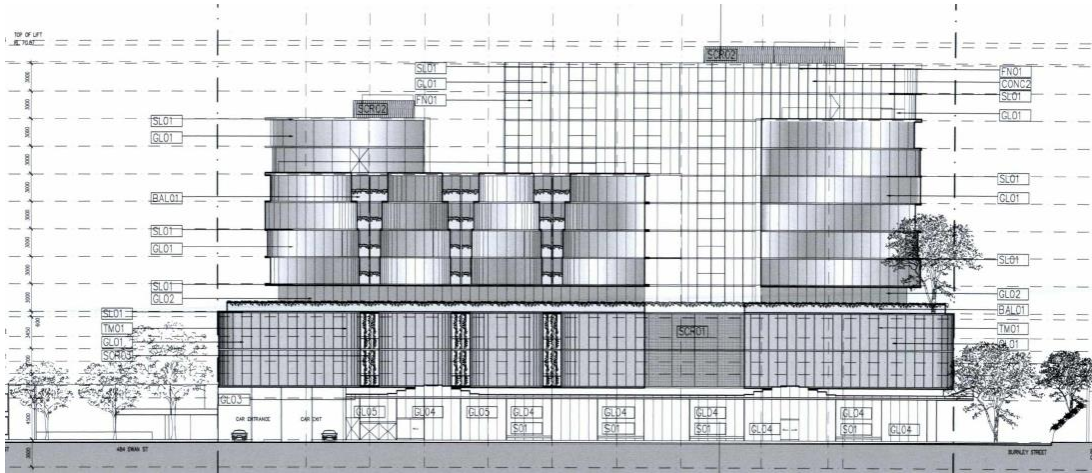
Swan Street Elevation of the 12-storey mixed use development approved at No. 462 – 482 Swan Street (Application material)
